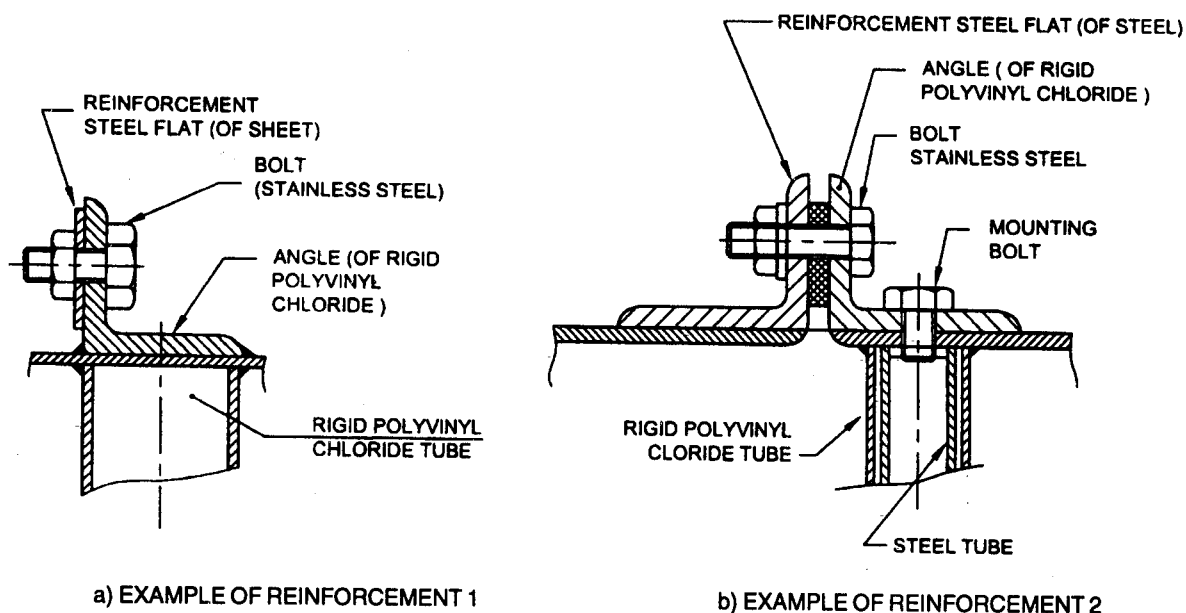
EXAMPLE OF EXTERNAL REINFORCEMENT AND INTERNAL REINFORCEMENT BY STRUT OF POLYVINYL CHLORIDE DUCT
